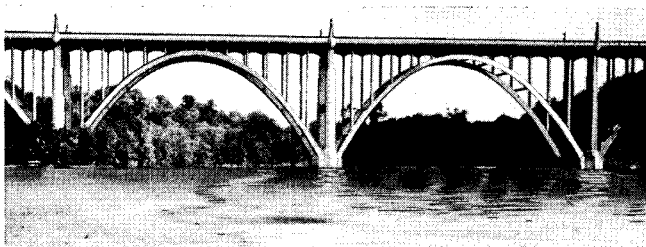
Typical open type (spandrel) concrete arch bridge.
